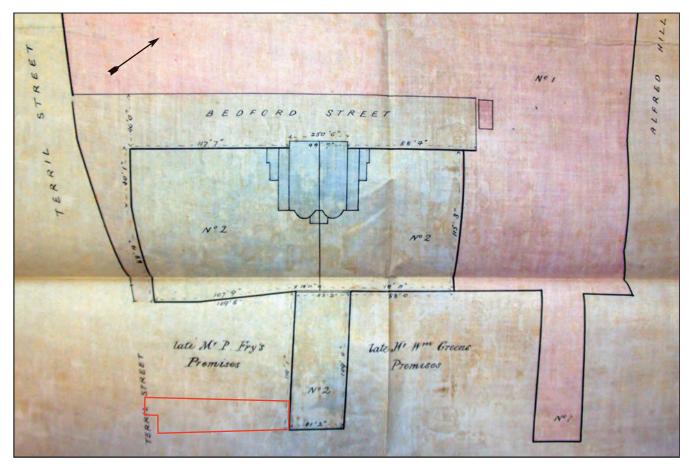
Extract from plan incorporating Beaufort House & Camden House in 'Bedford Street', 1822 (BRO)
